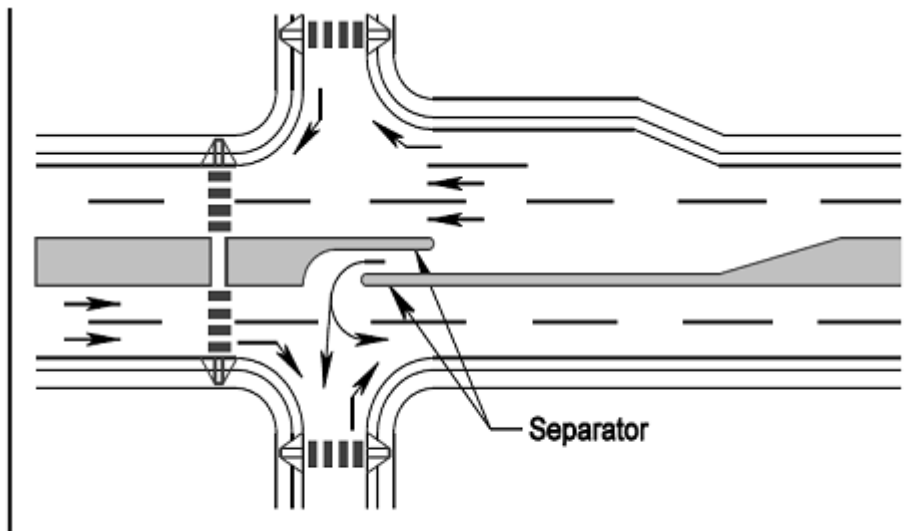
Channelized, at-grade intersection of arterial streets. (Source: Rensselaer Co., New York, and Parsons Brinckerhoff.)
